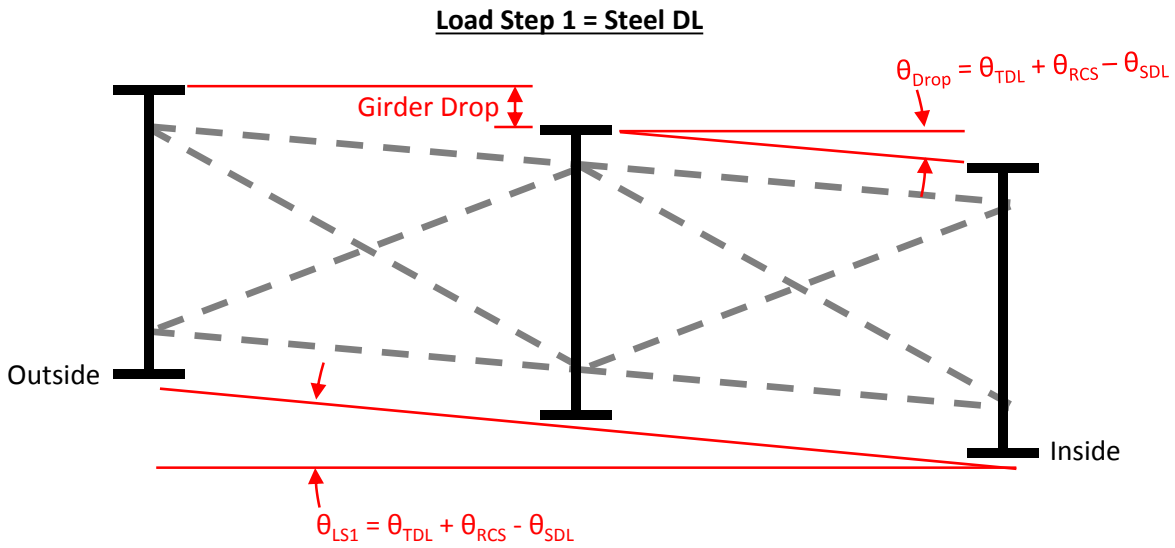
Load Step 1 – Steel I-Girder System Twist SDF – Section A-A
